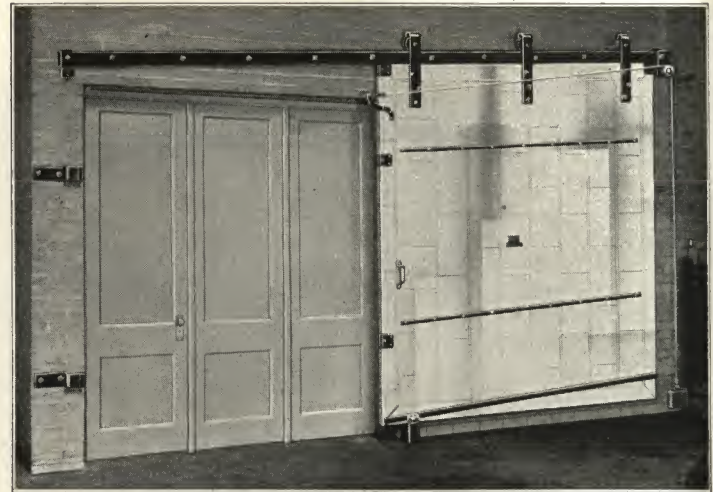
Large Size Sliding Fire Door. Used at Openings in Corridor or Room Partition Walls.
